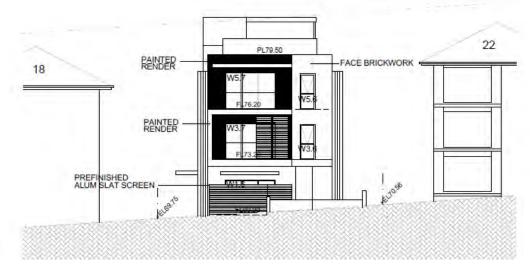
Streetscape with the development similar in scale to the adjoining buildings.
